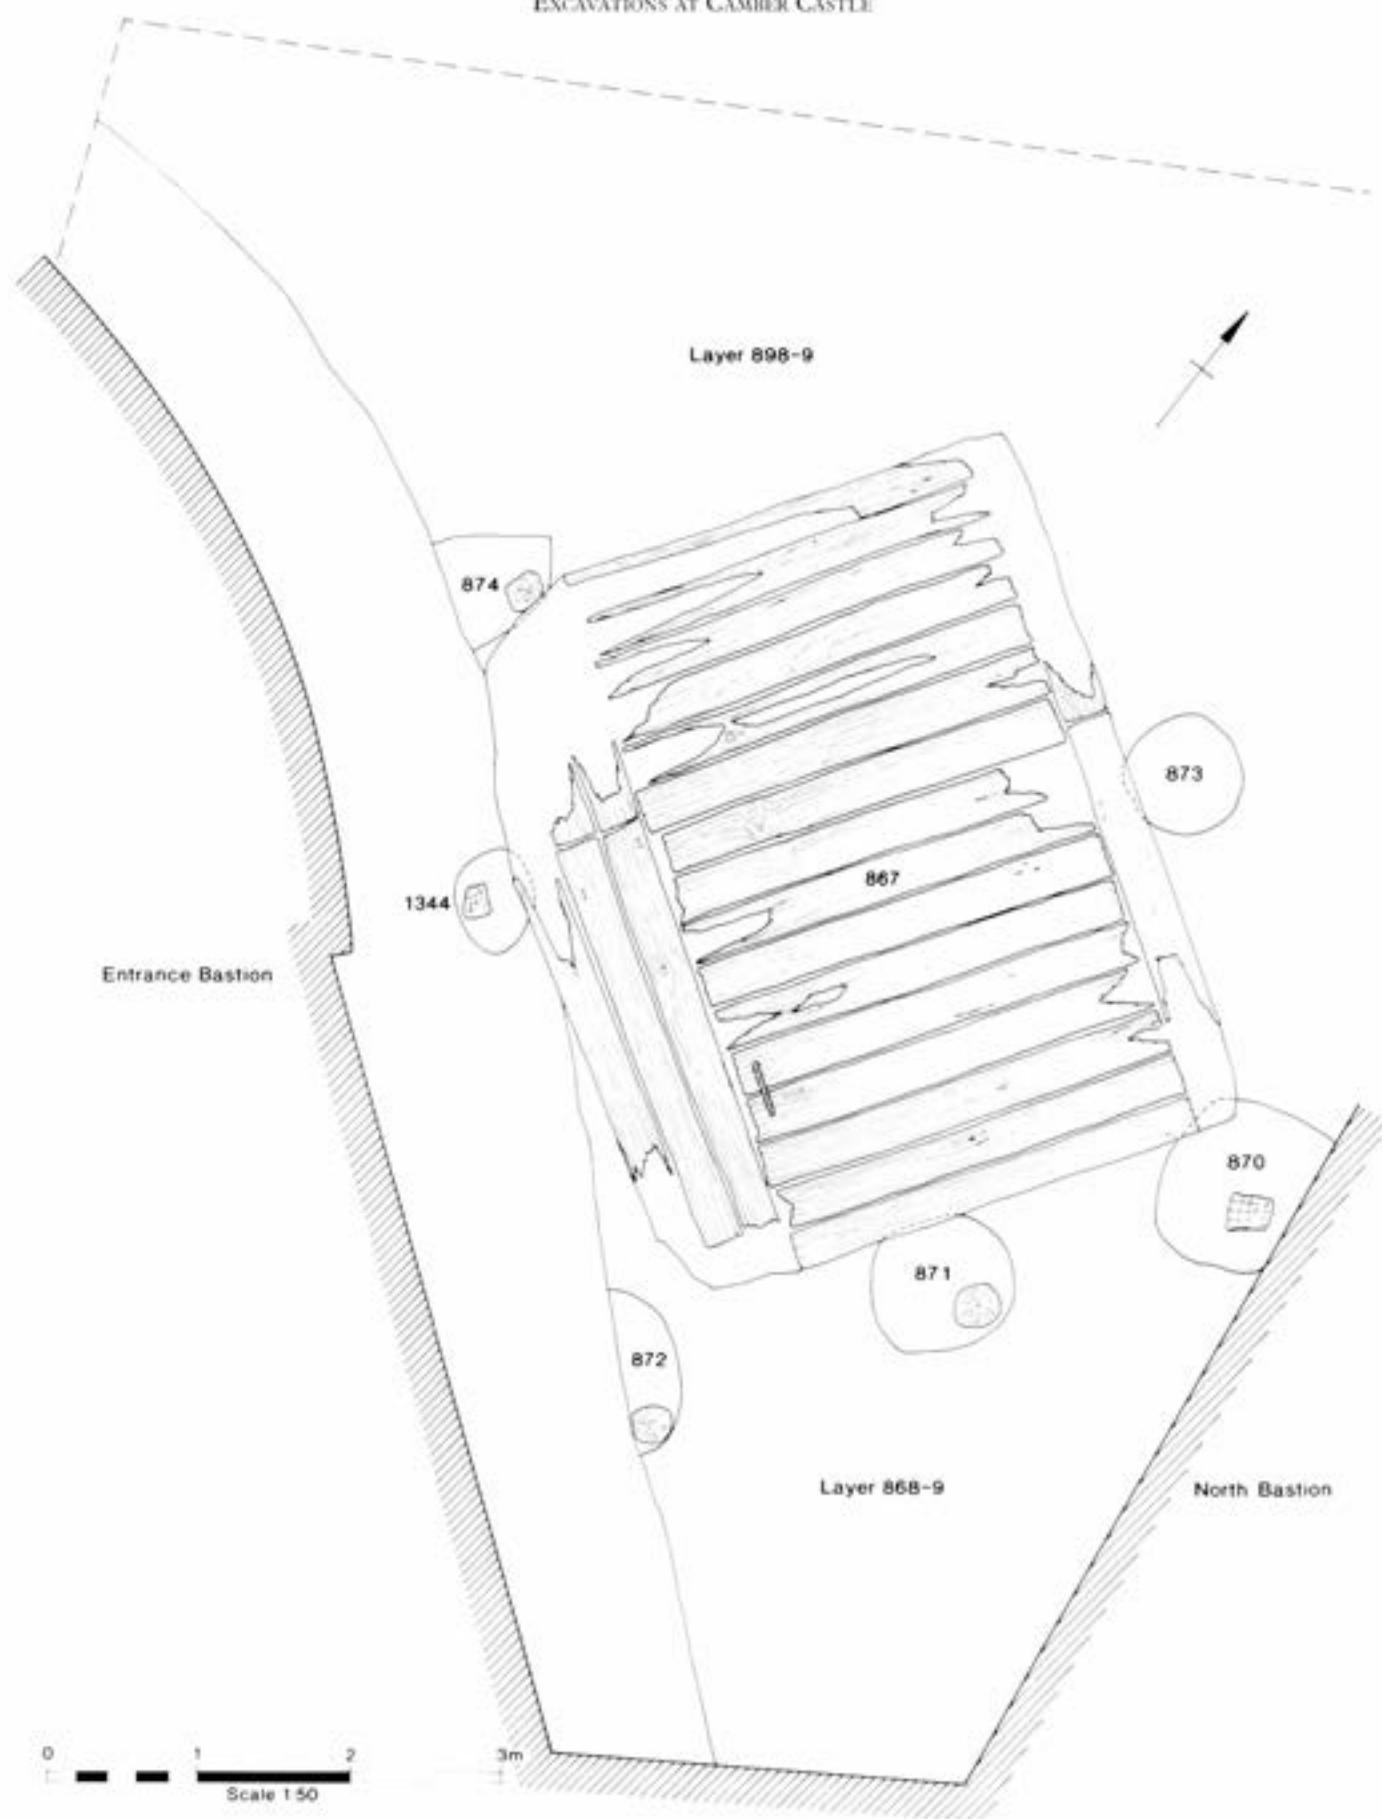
Modern wooden structure adjacent to Entrance Bastion: plan
